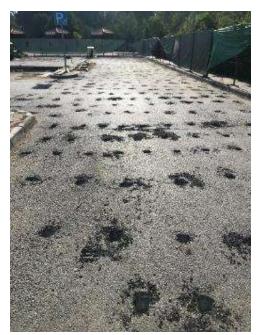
Removal of the existing surface and laying the layers of permeable surface
